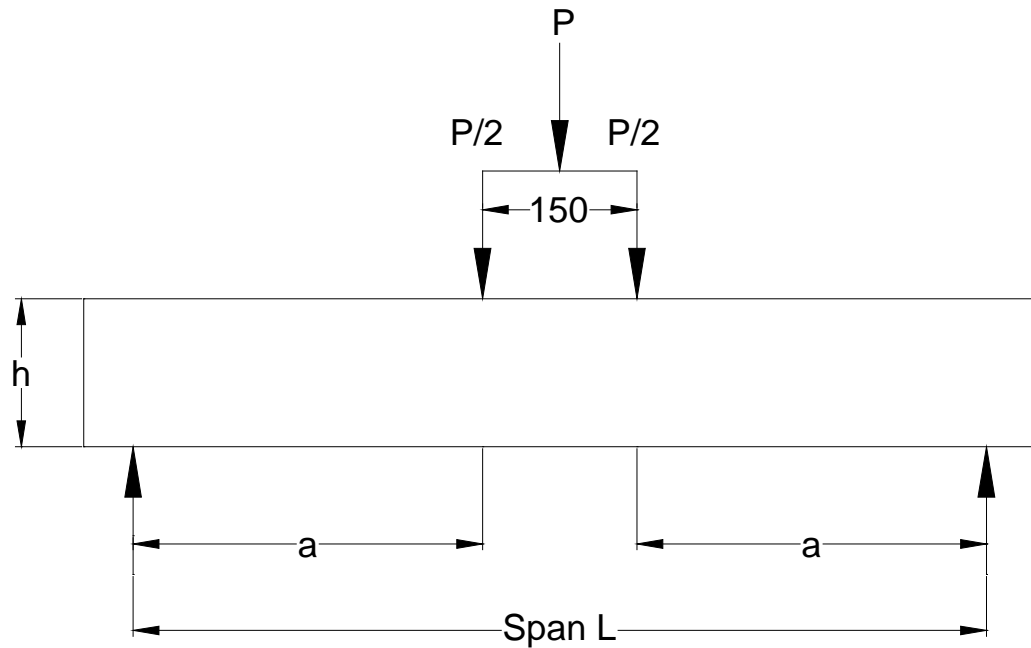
Four point bending test of UHPC reinforced bars beam.
